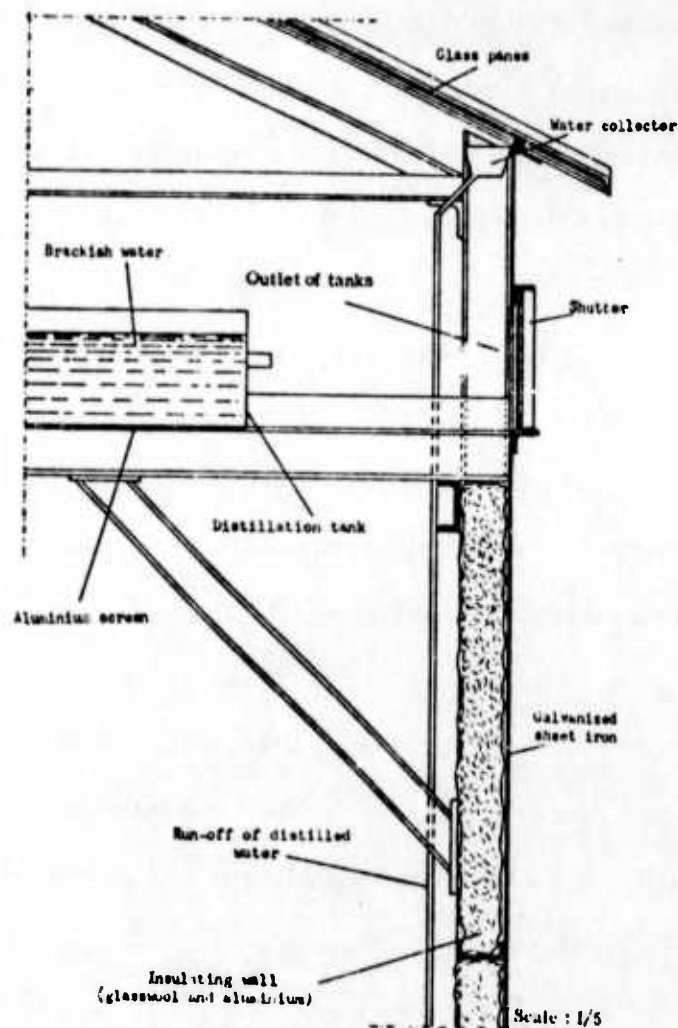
Detail of greenhouse with arrangement of water collectors and the structure of the lateral walls [77].
